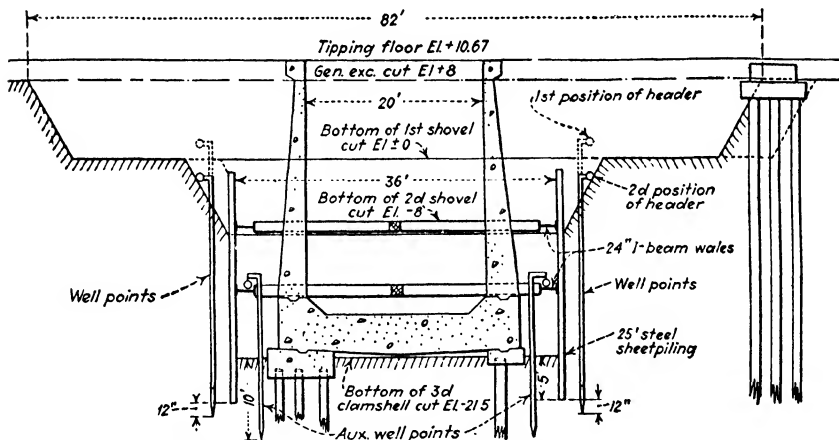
Section of Bin Pit Showing Well-point Arrangement.
